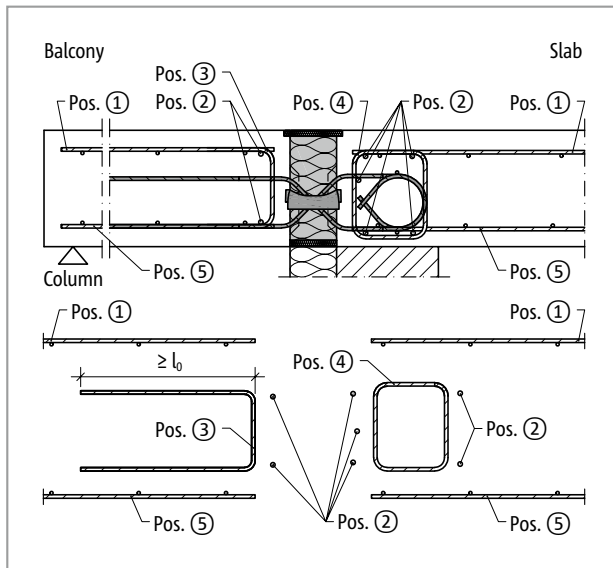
Schöck Isokorb® T type Q-VV1 up to Q-VV5: On-site reinforcement
